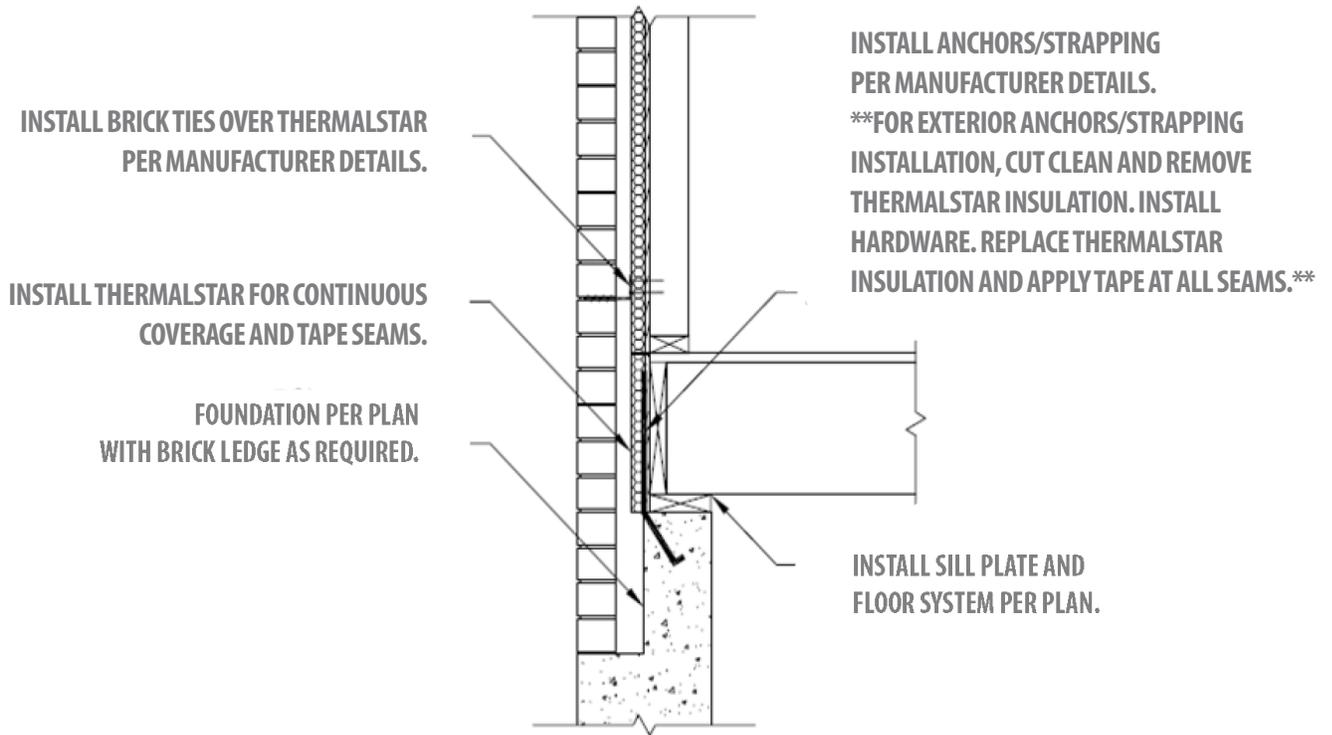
TYPICAL WALL SECTION AT FLOOR DECK WITH BRICK
